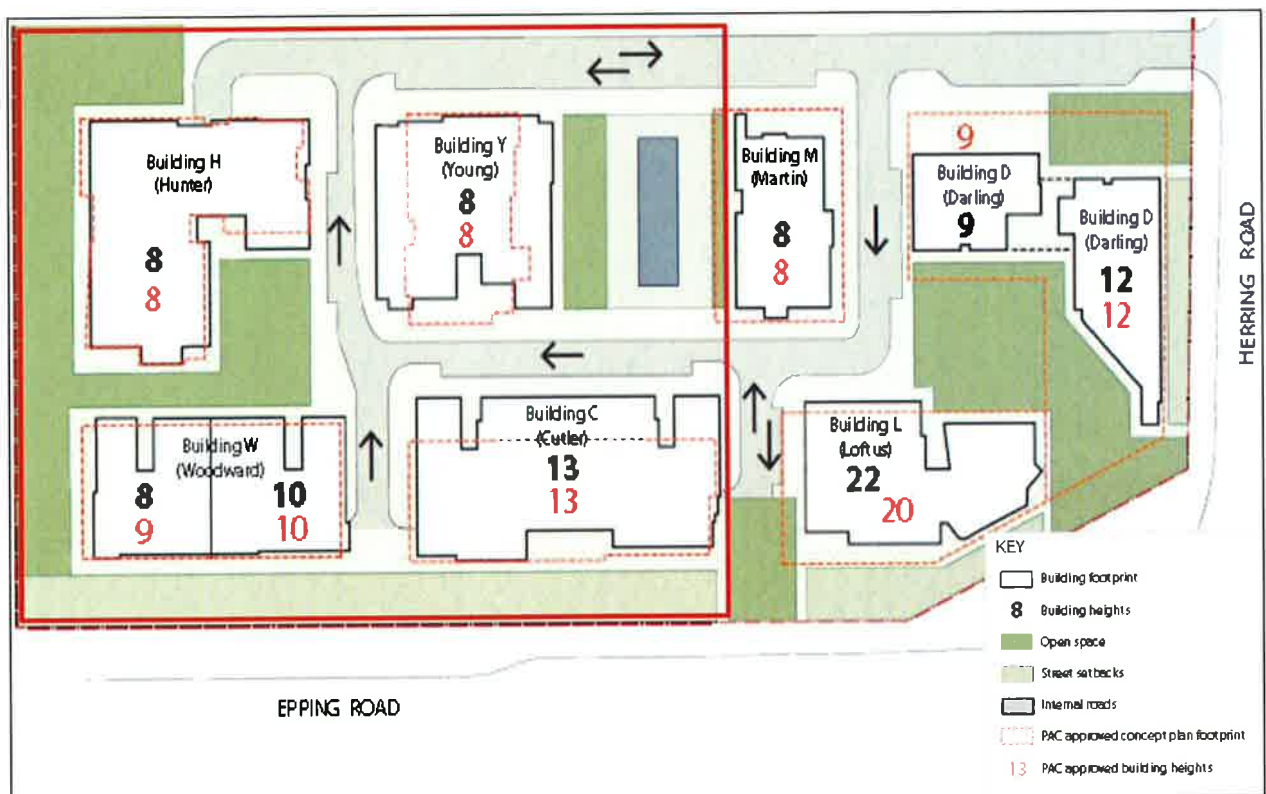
Approved modified layout (Stage 1 Project Approval shown in red outline)
